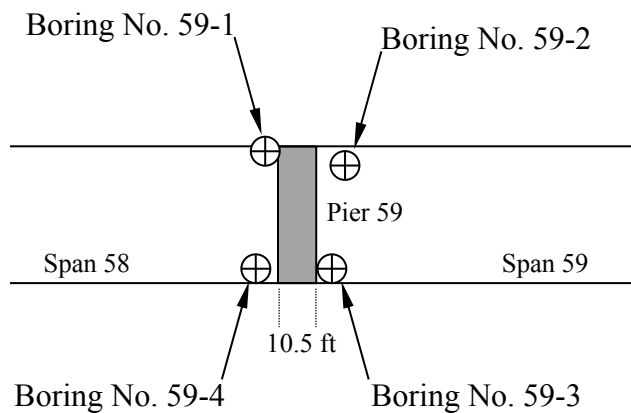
Plan-view schematic of boring placement near Pier 59
